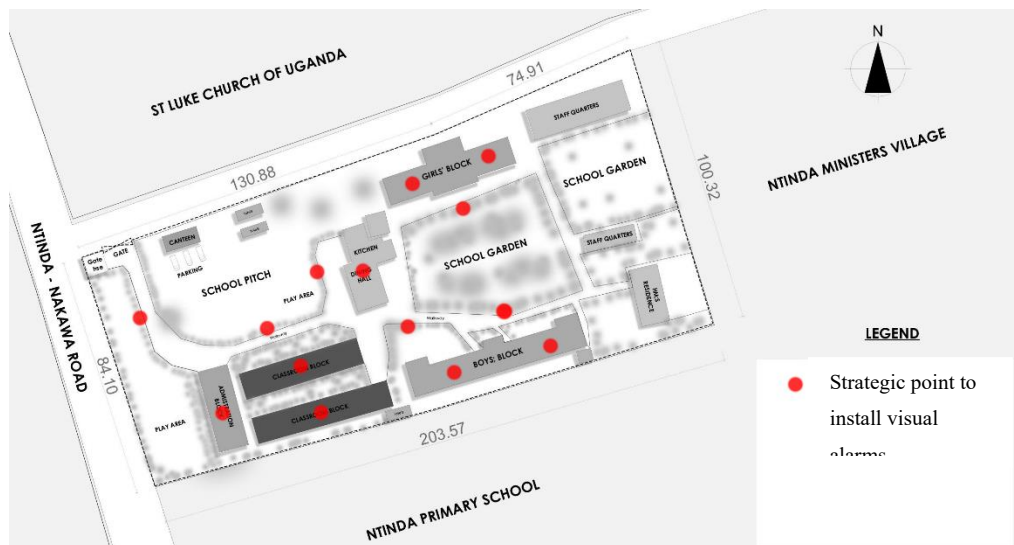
Site plan showing strategic locations of visual alarms in the school.
